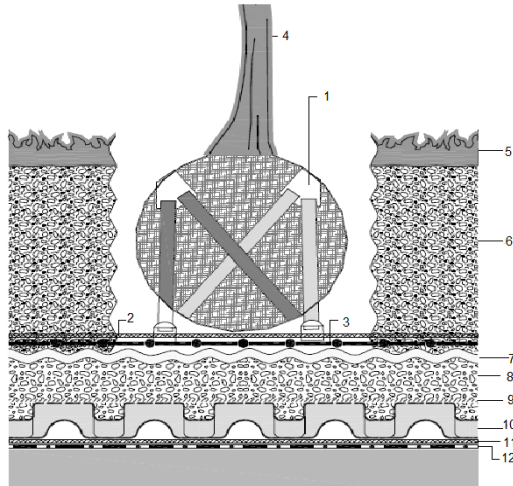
, 1. Root ball anchorage.2. Biodegradable fiber ,e.g. coco-material (optional) .3 .Reinforcement steel mesh.4. Tree.5. Lawn.6. System Substrate.7. Drainage pipes.8. mineral substrate.9. Filter Sheet .10. Drainage Element, filled with mineral substrate.11. Protection Material .12. Roof construction with root-resistant waterproofing.
